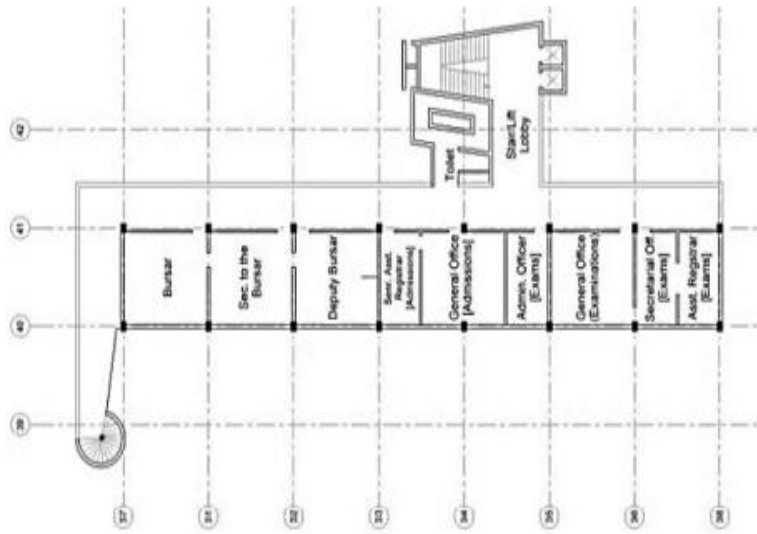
Second floor plan of OAU Senate Building (Source Author's Field work)
